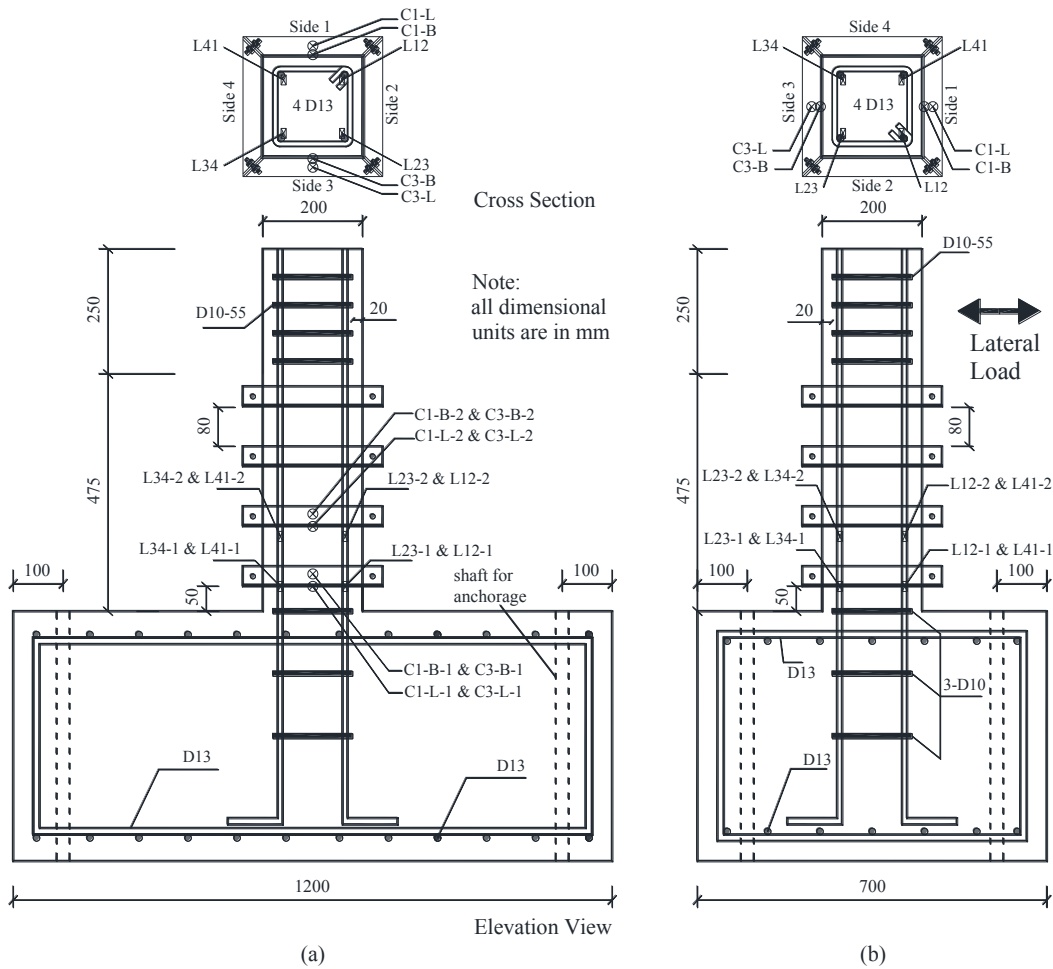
Elevation view and cross section of Specimen CS12 : (a) transverse to lateral load direction ; (b) in lateral load direction
